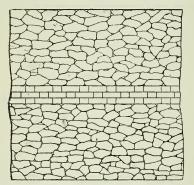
Random Rubble Wall with Brick Lacing Course.
